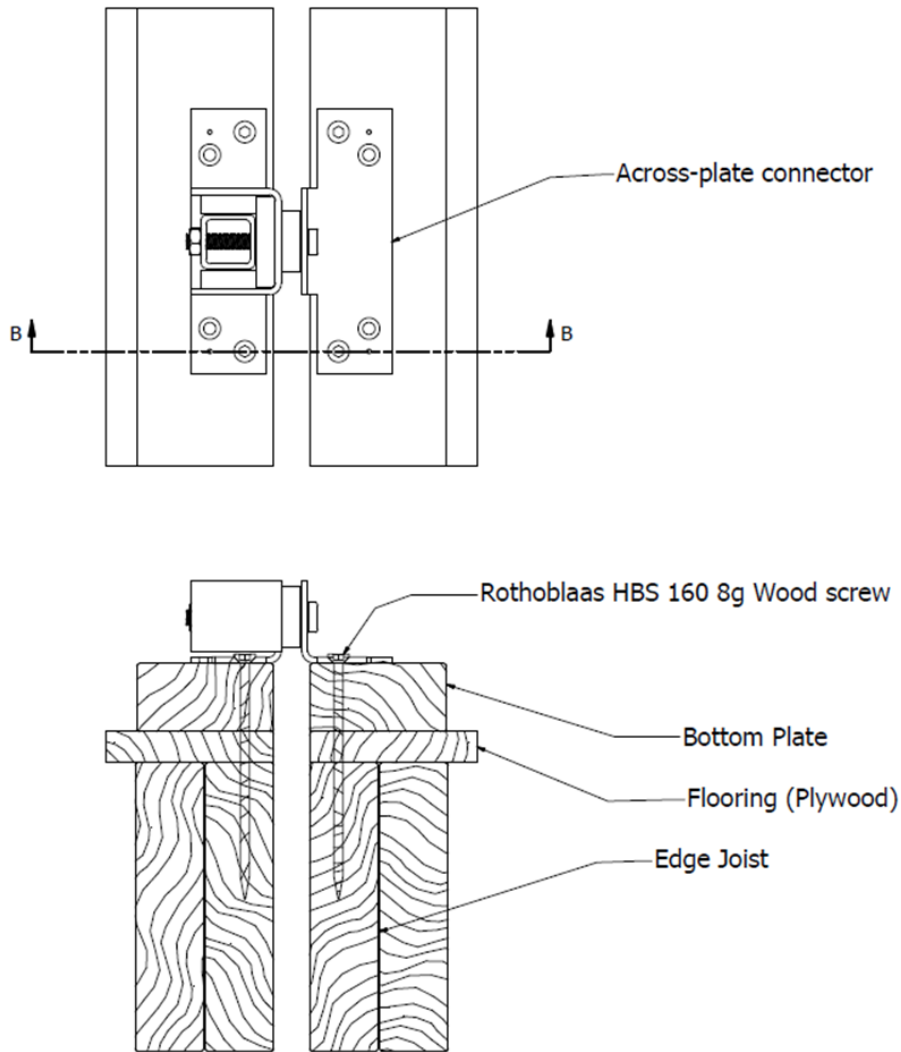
Diagram of across-plate connector installed on to bottom plate, showing installation position of 160mm wood screws, screwed into edge joists.
